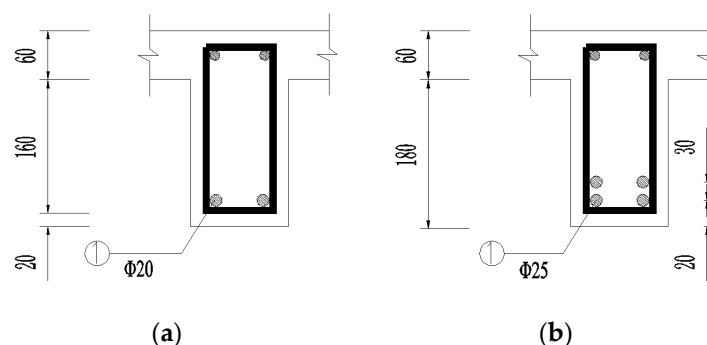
Reinforcement diagram of Single T section. (a) Original reinforcement diagram of single T section. (b). Improved reinforcement diagram of single T section.
